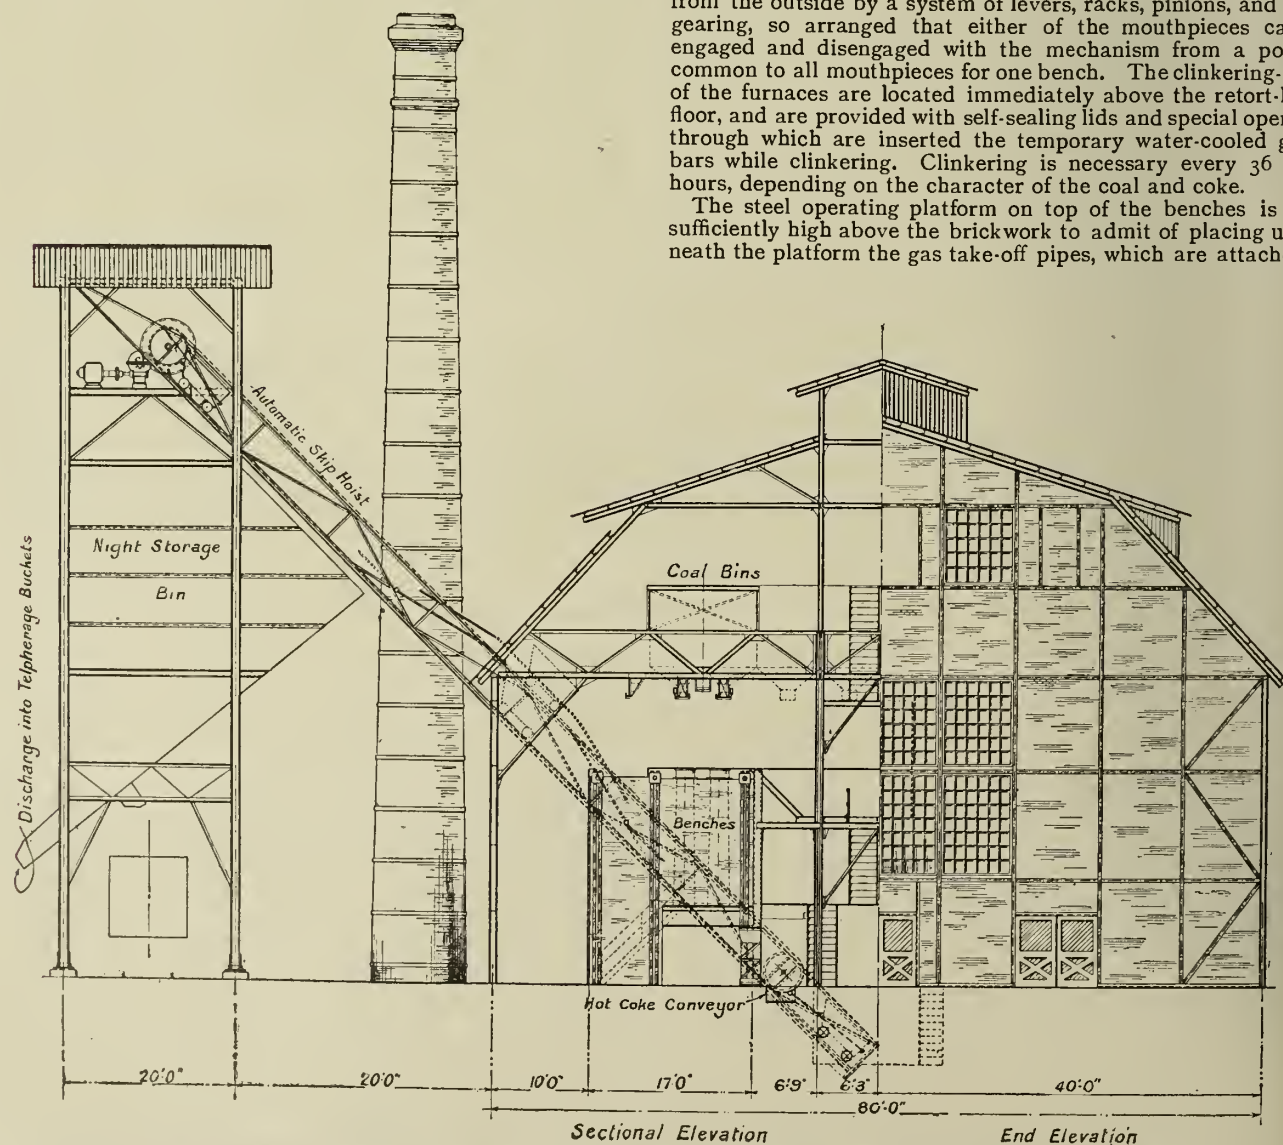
End Elevation and Cross Section of the Retort-House, Showing the Automatic Skip-Hoist and Night Coal-Storage Bin.
